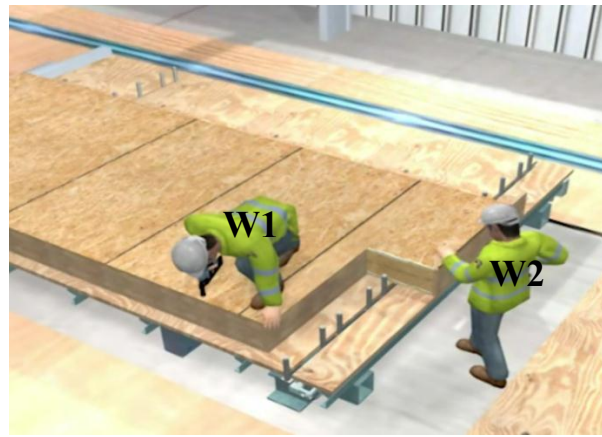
Floor framing (nailing of sheathing boards in awkward postures)
